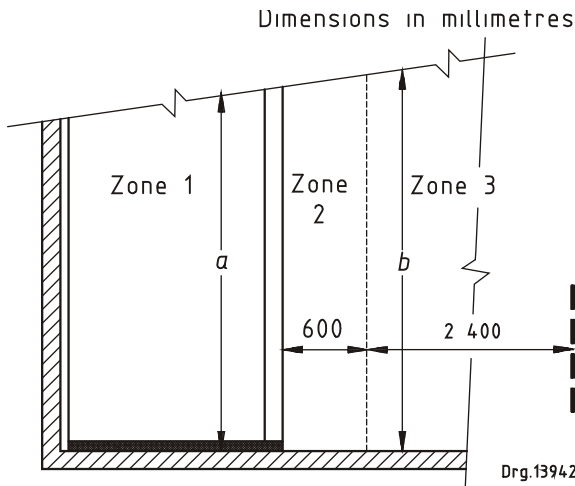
Plan of zone dimensions for a prefabricated shower cabinet
